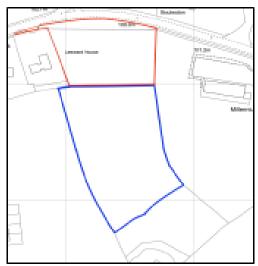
and 2: Extract of illustrative Block Plan and Location Plan
